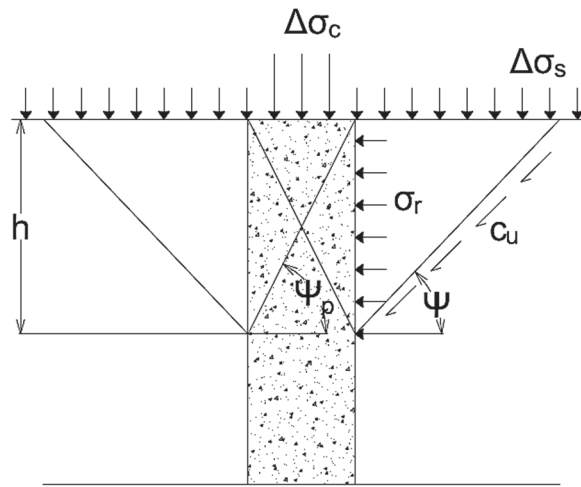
Granular column failure wedge (after Han (2015))
